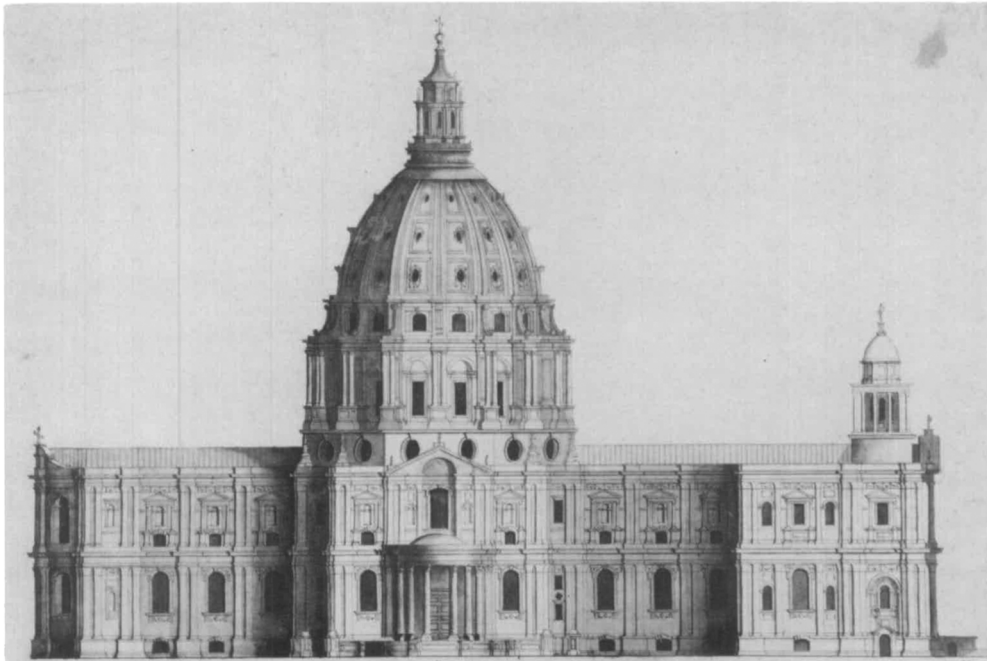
St Paul's. Anonymous north elevation (Whitworth Art Gallery)
